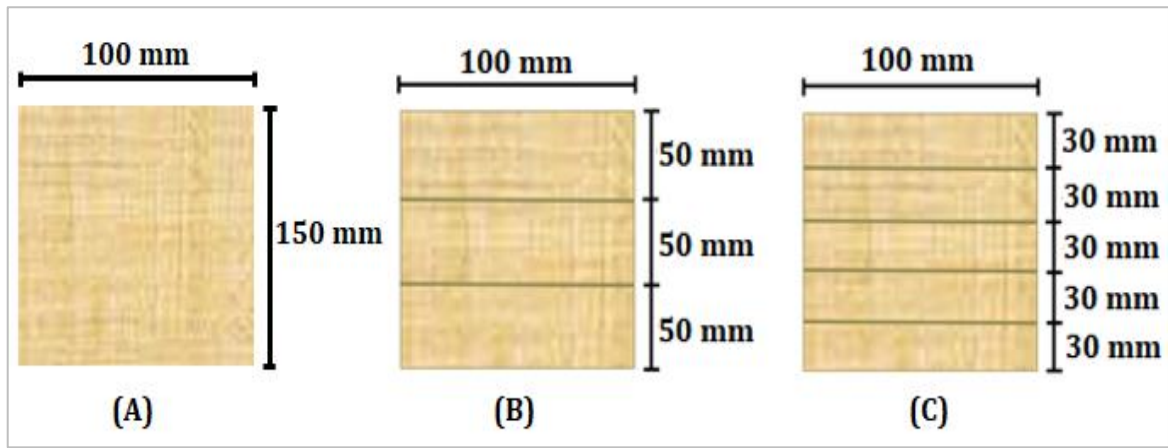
The cross-sectional view of the beams, (A); Solid (B)3-Layer, (C); 5-Layer.
